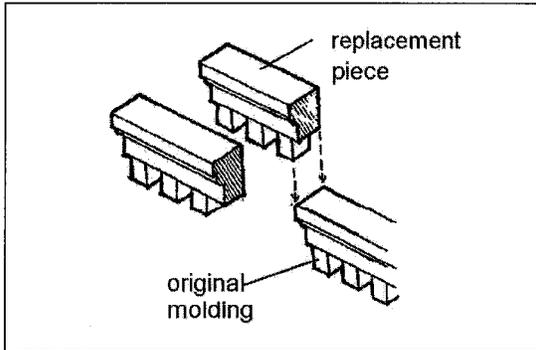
Original architectural features that have deteriorated beyond repair shall be replaced in kind.
